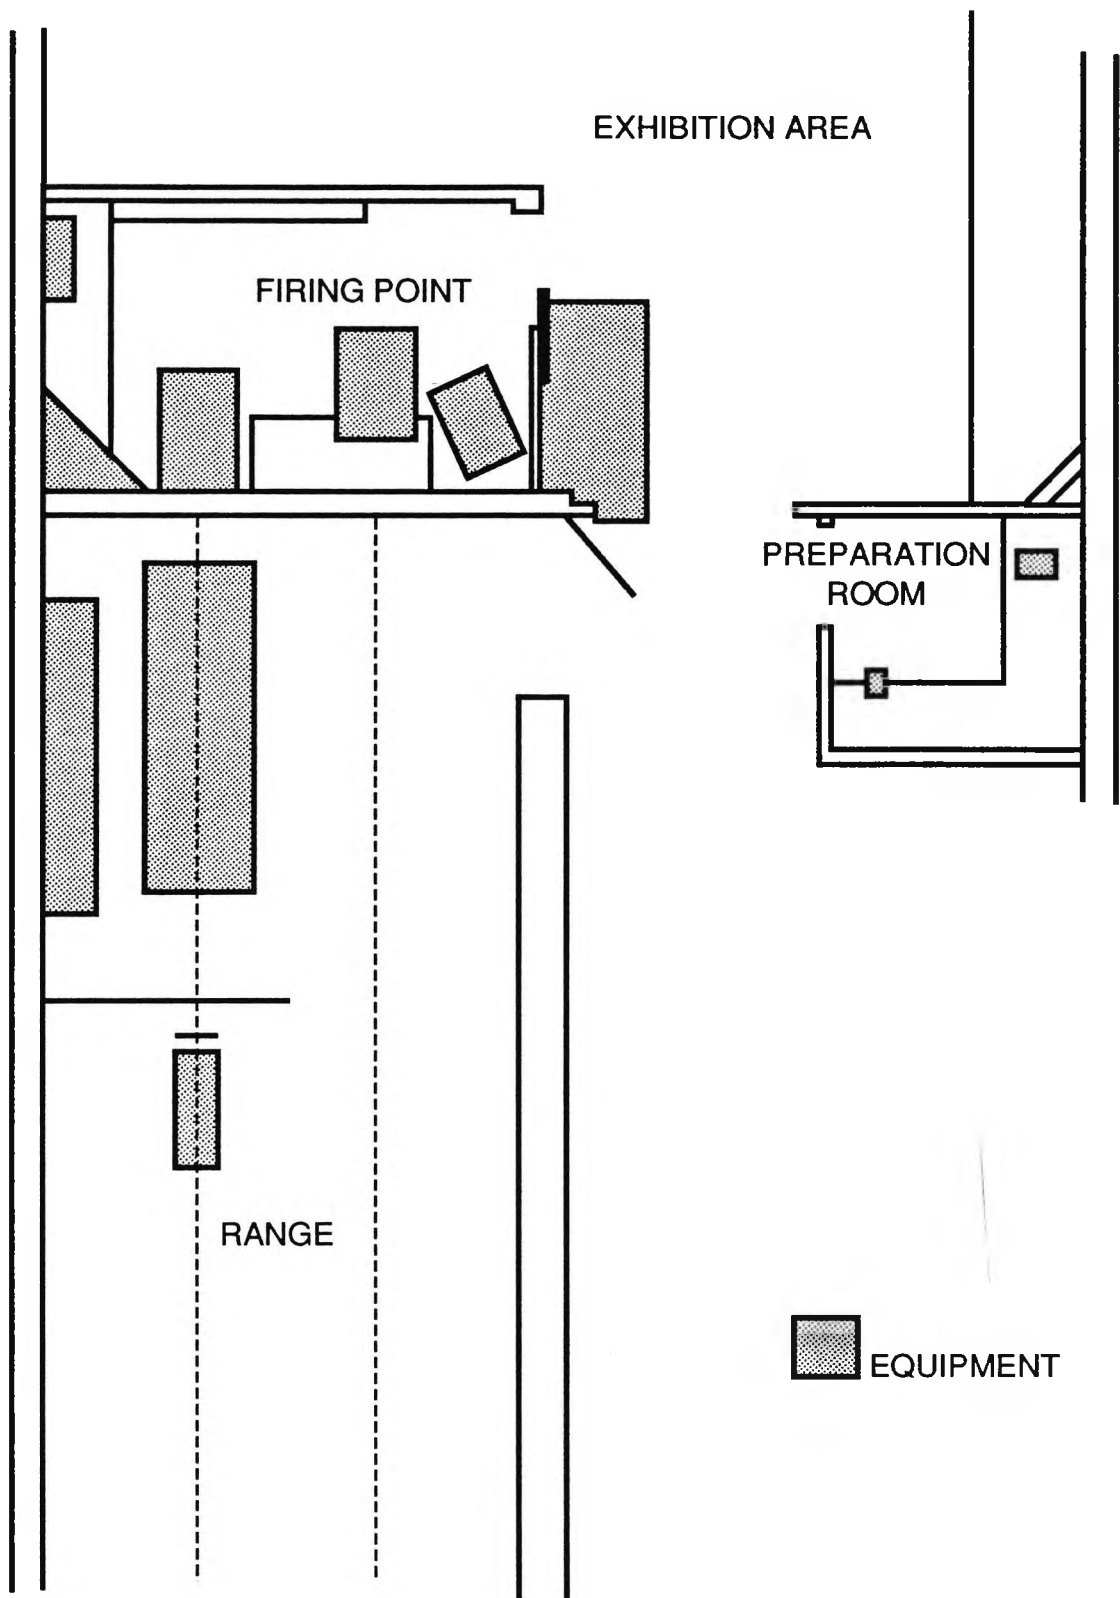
PLAN OF BALLISTIC TEST FACILITY.
